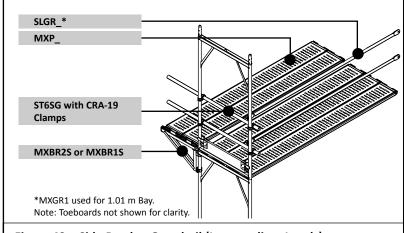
Side Bracket Guardrail (Intermediate Levels): Tube and Clamp with ST6SG
